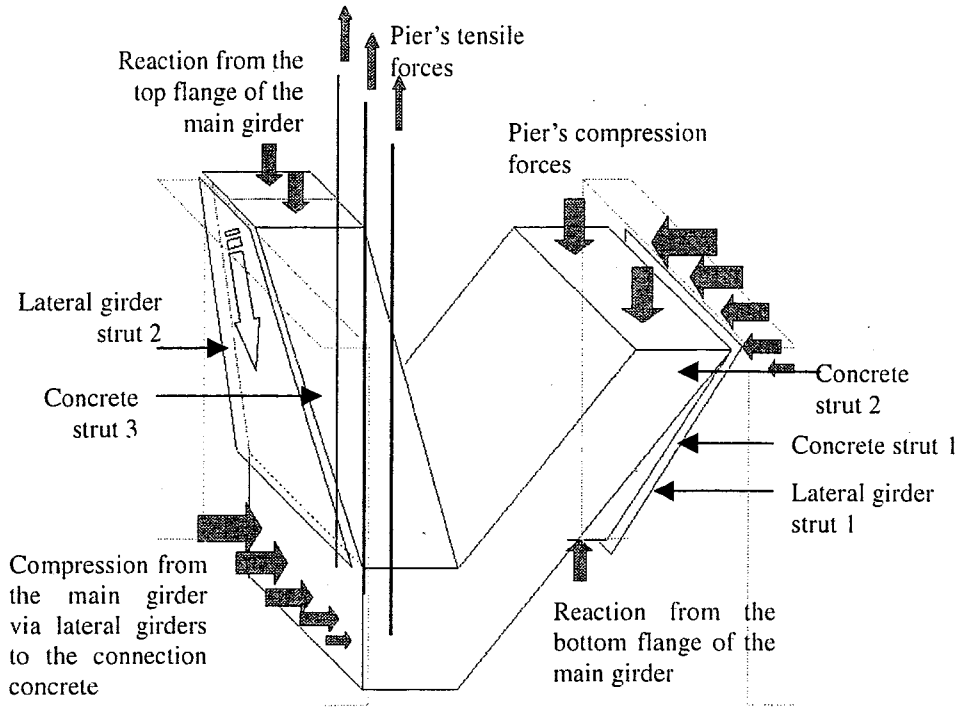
Force transfer mechanisms inside connection concrete of specimen C-2.
